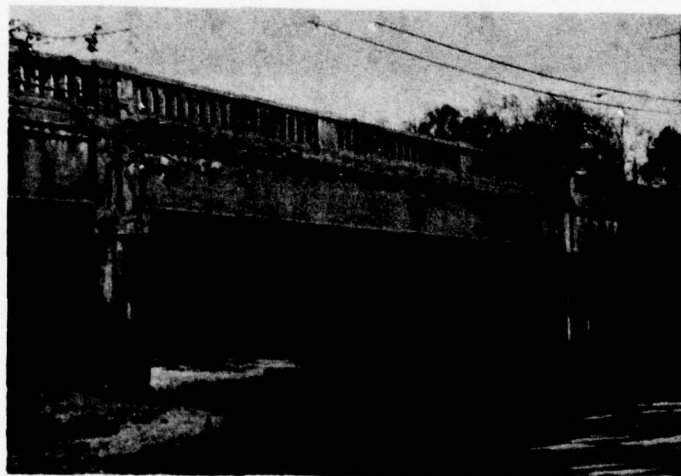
State Route 34 crossing Lake Lefferts. 2,500 ft. upstream of dam embankment at Ravine Drive
